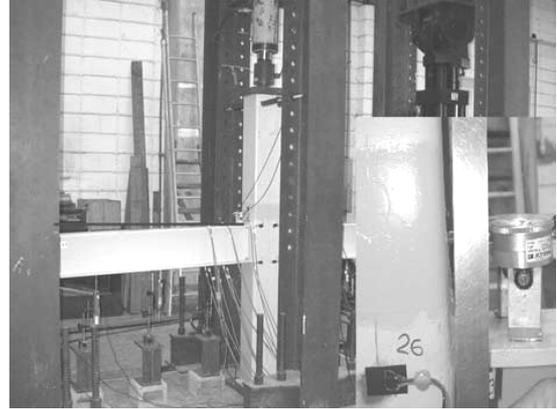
Typical failure mode for the C3 welded detail
